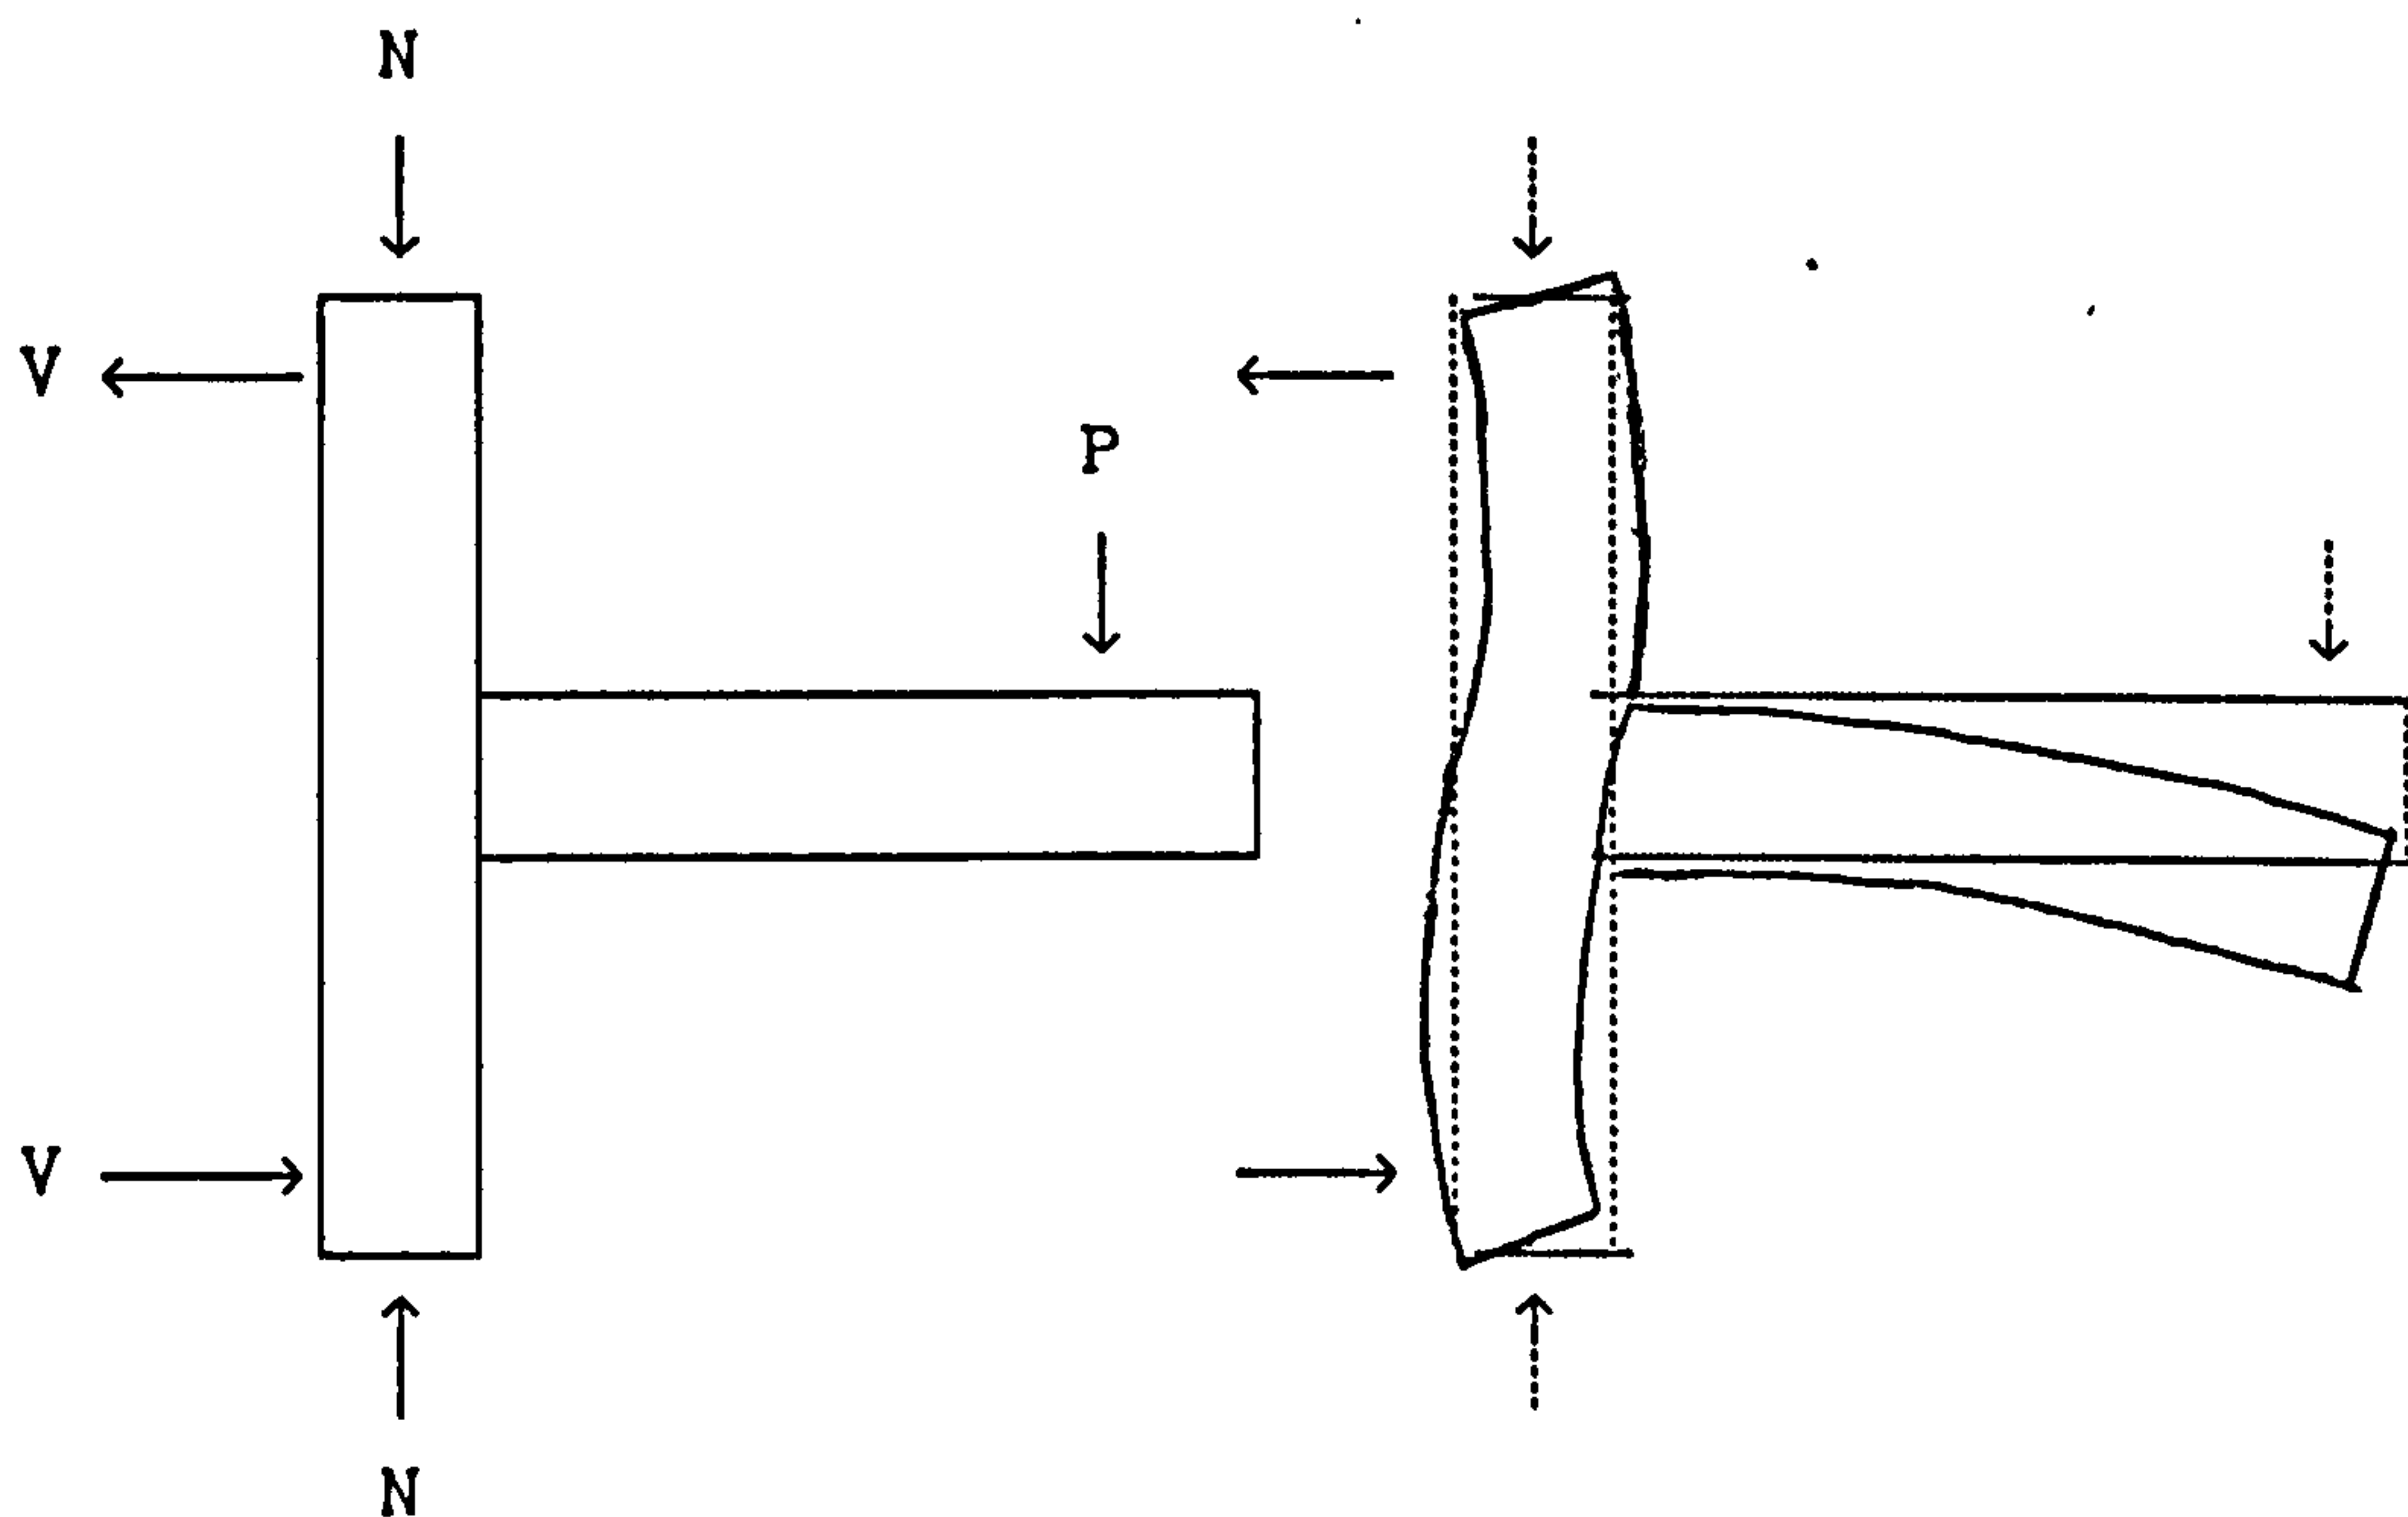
Deformed Shape of Beam-Column Sub-assembly
